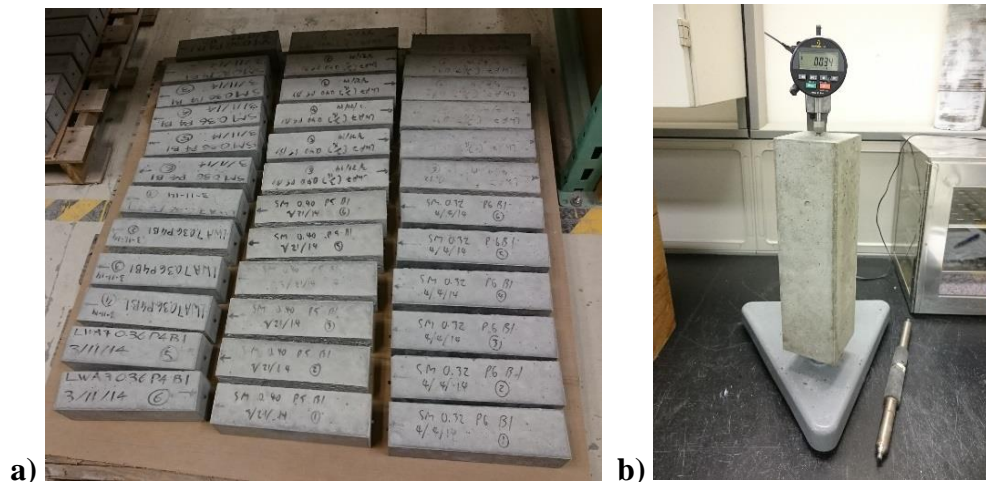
a) Concrete prism specimens. b) Drying shrinkage testing on a concrete prism specimen.
